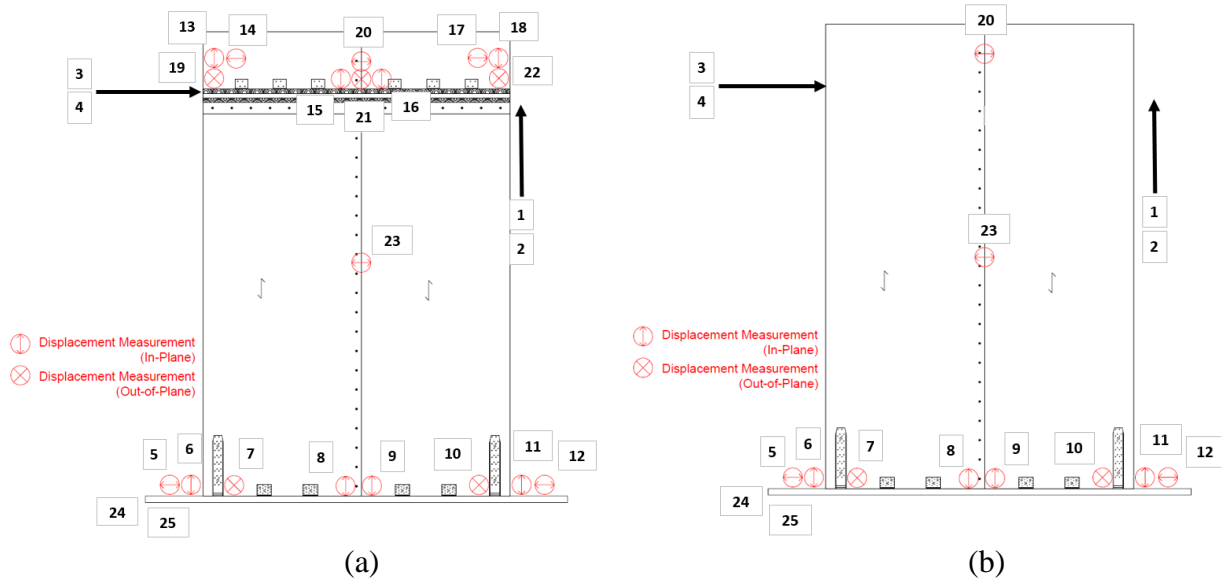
Biaxial Wall Test Instrumentation Schematic
